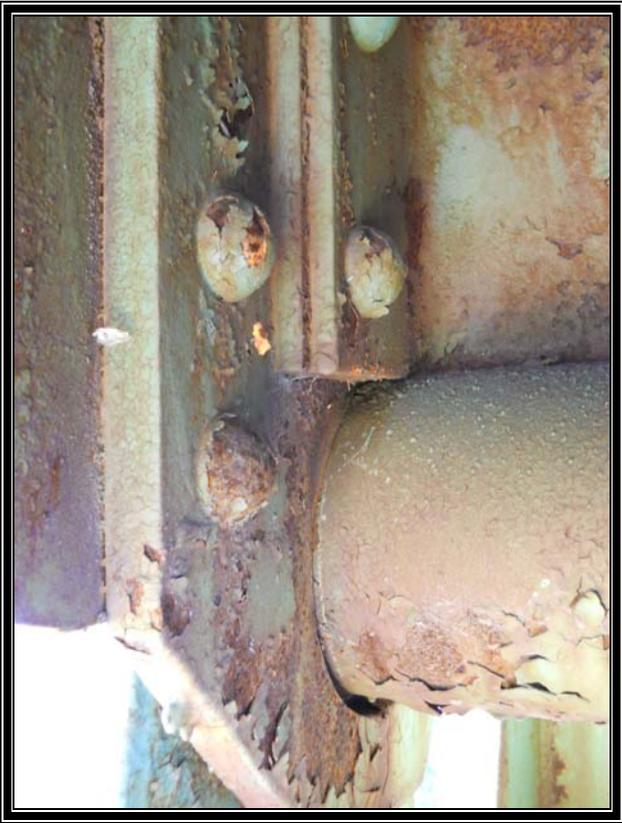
Span 2 South Truss Rocker Bearing Crushing of Bearing Plate
